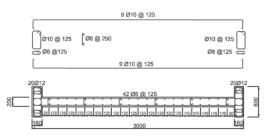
Reinforcement layout of T6 specimen (unit : mm)
